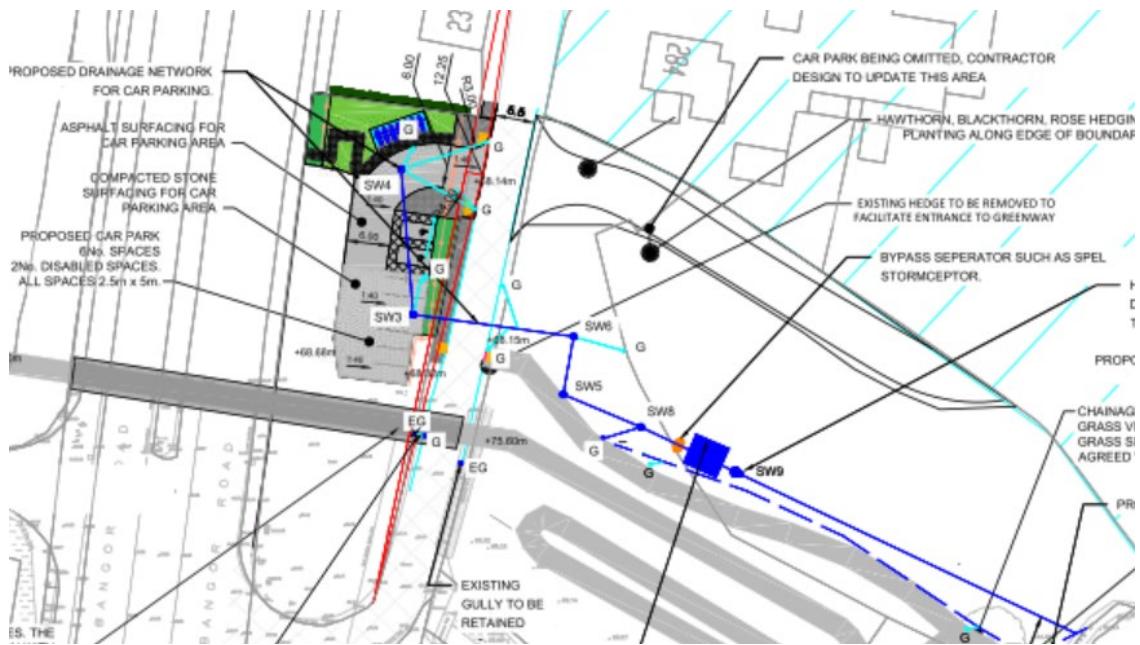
Proposed car park layout as per LA06/2025/0789/F
